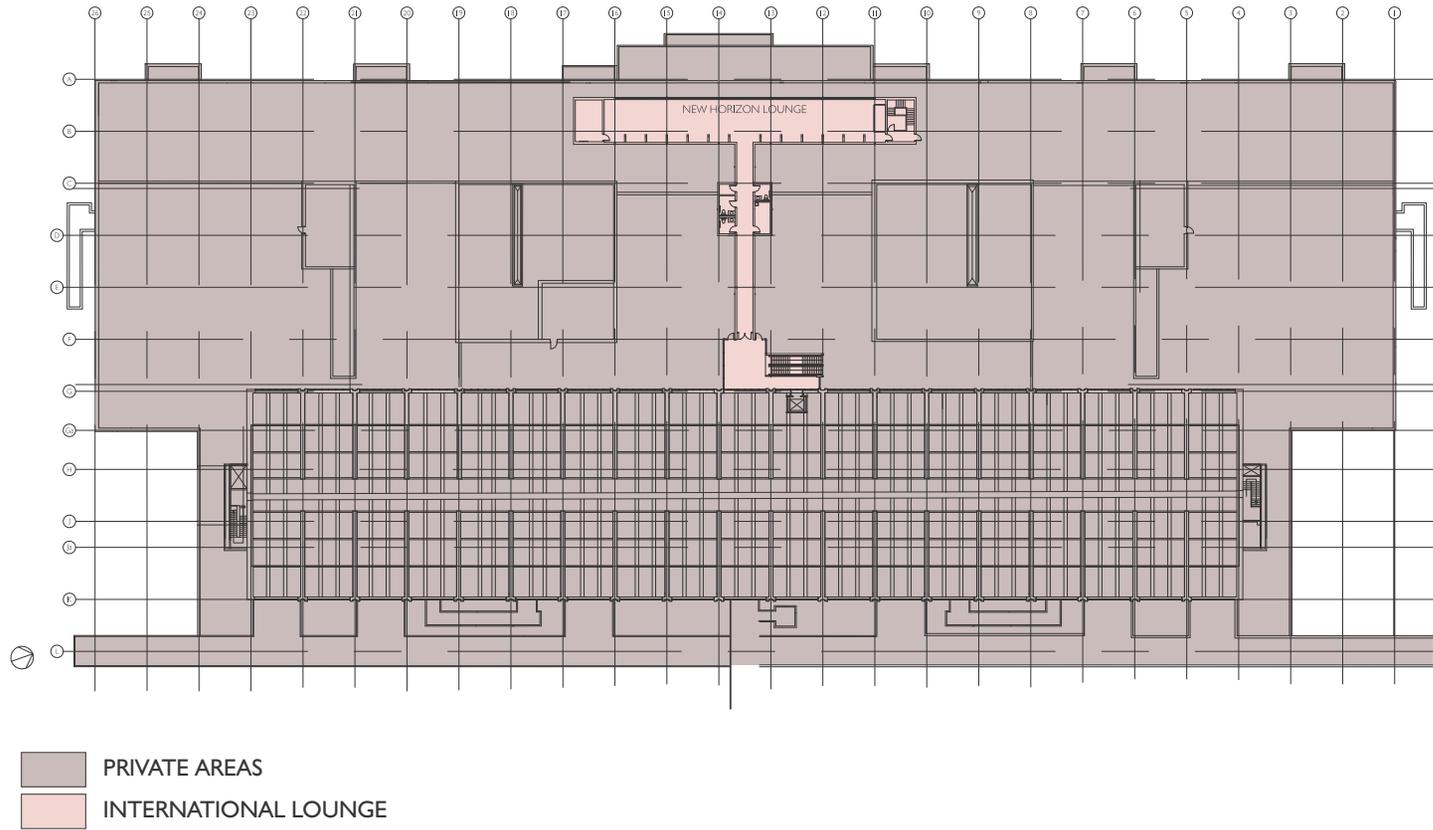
Third Level: Existing Winnipeg International Airport Floorplan
